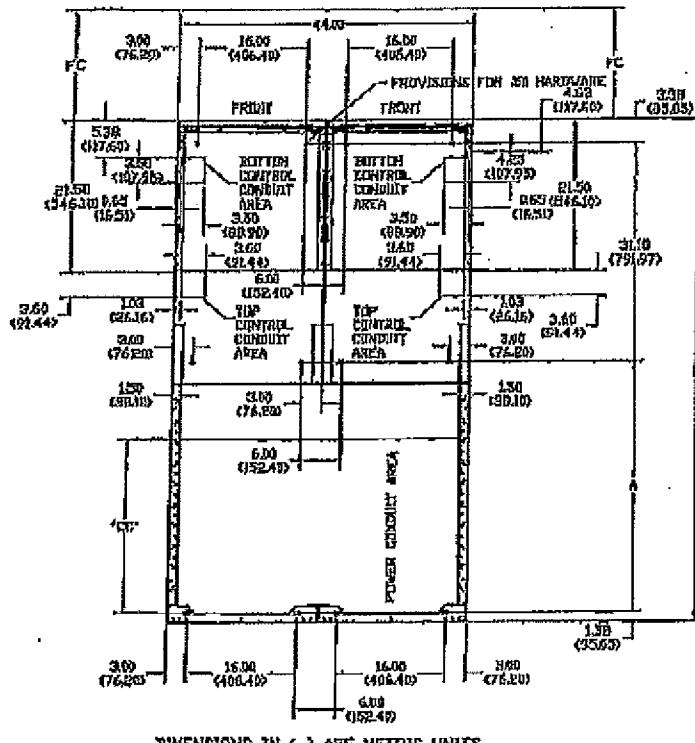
Indoor Equipment Location of Anchor Points and Conduit Location (continued)
